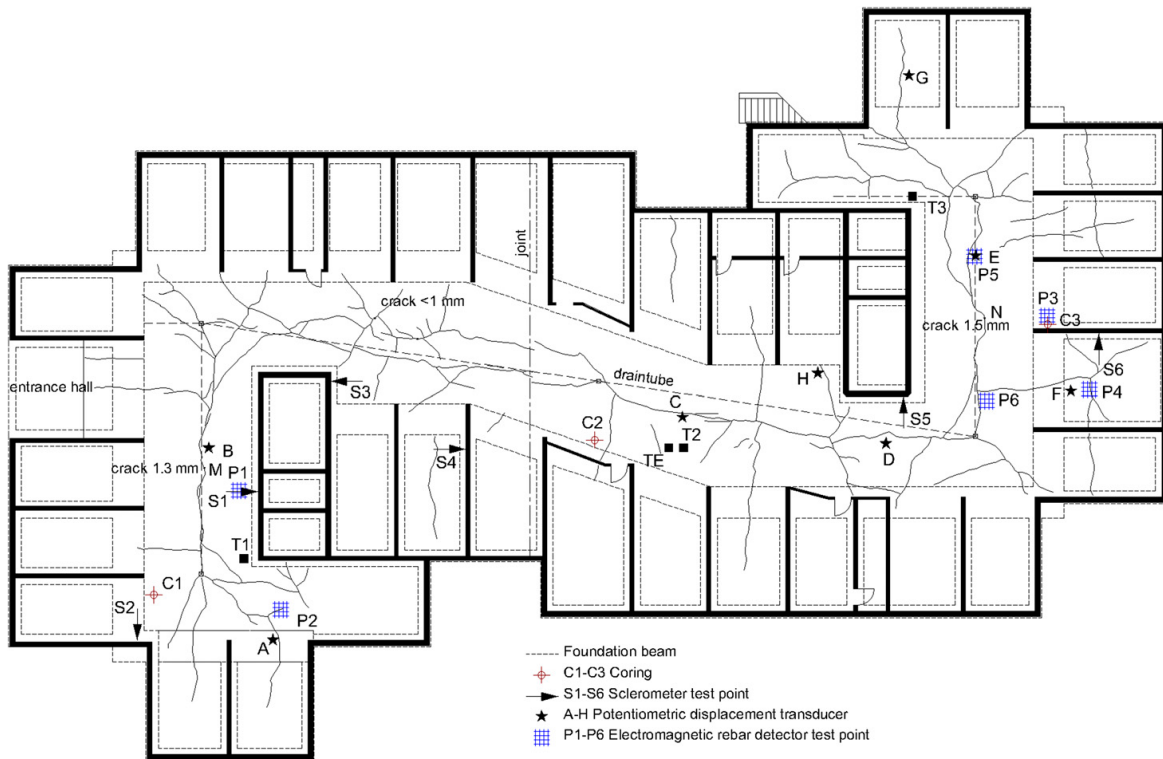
Plan of case study and cracks propagated in the mat foundation (Russo et al. 2013)
